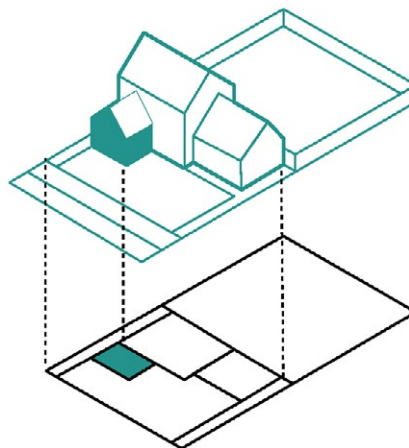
An acceptable example of a front extension which is smaller in scale than the existing building, mirrors the roof pitch, and covers less than 50% of the front elevation.
